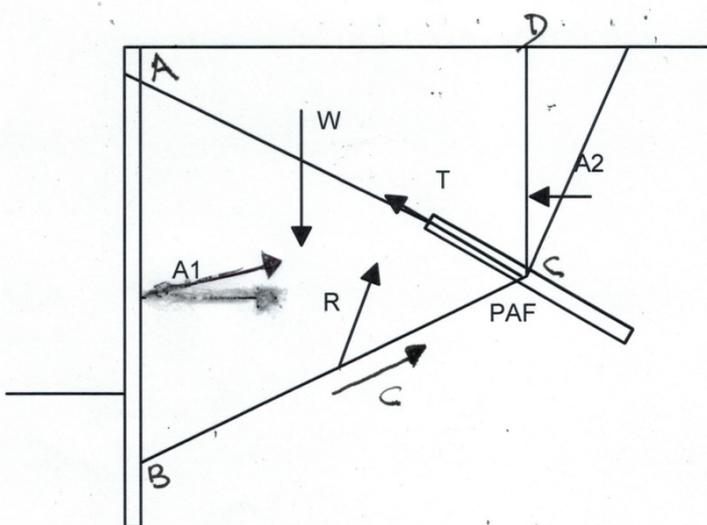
Determination of anchor length to prevent interaction with retaining structure
